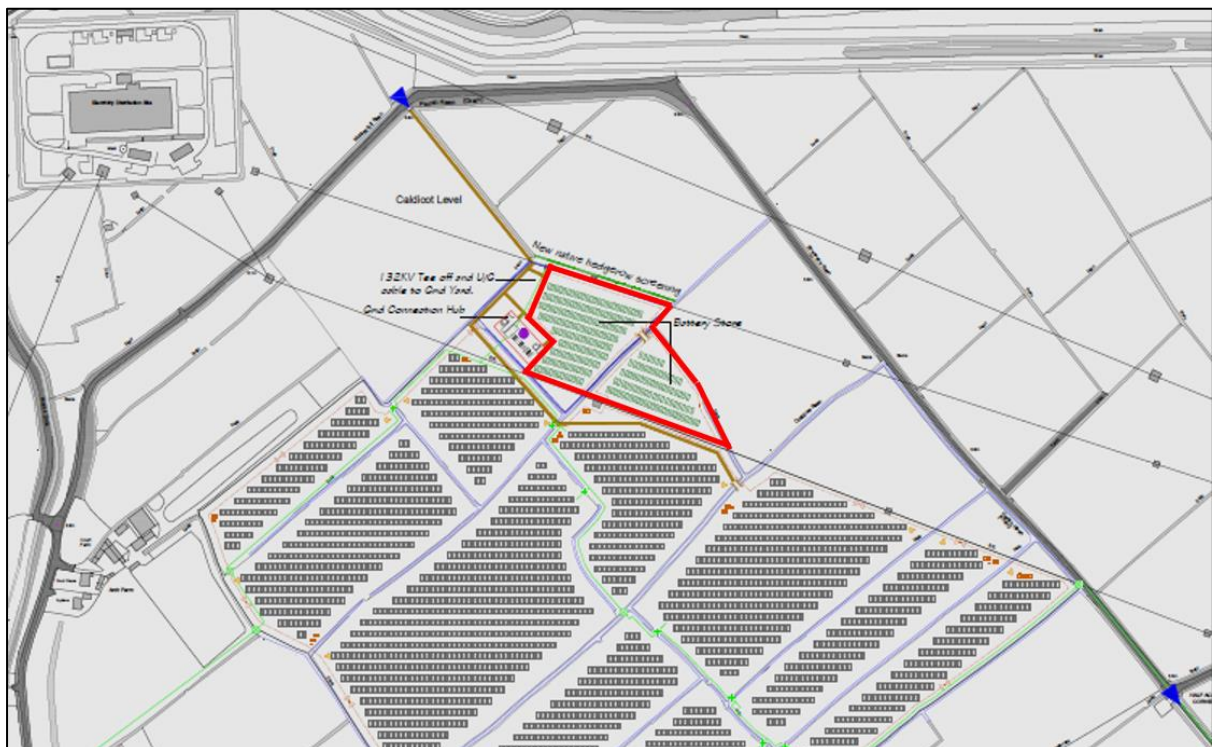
Area of proposed scheme to be considered as a Secondary Consent
